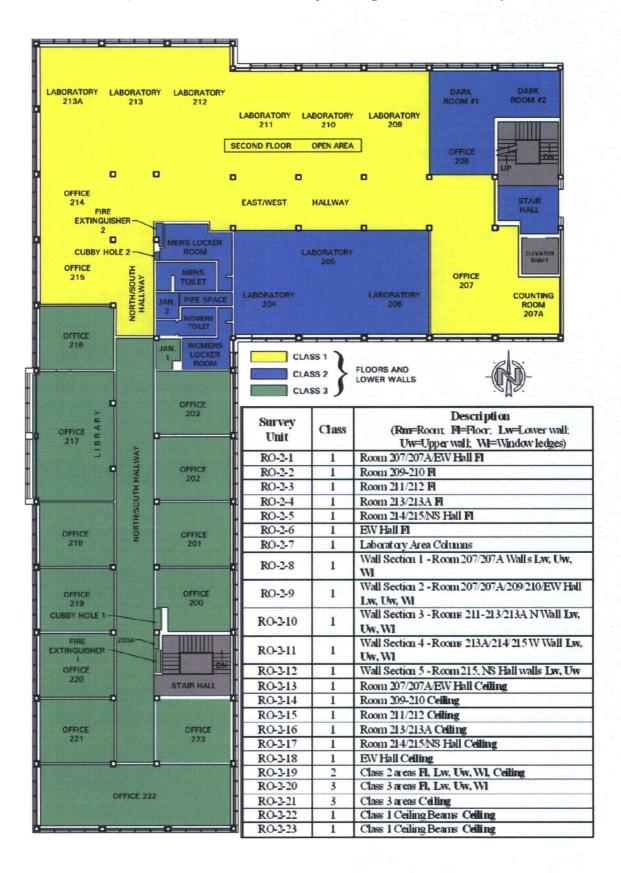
, Reactor Office and Laboratory Building Second Floor Survey Units
